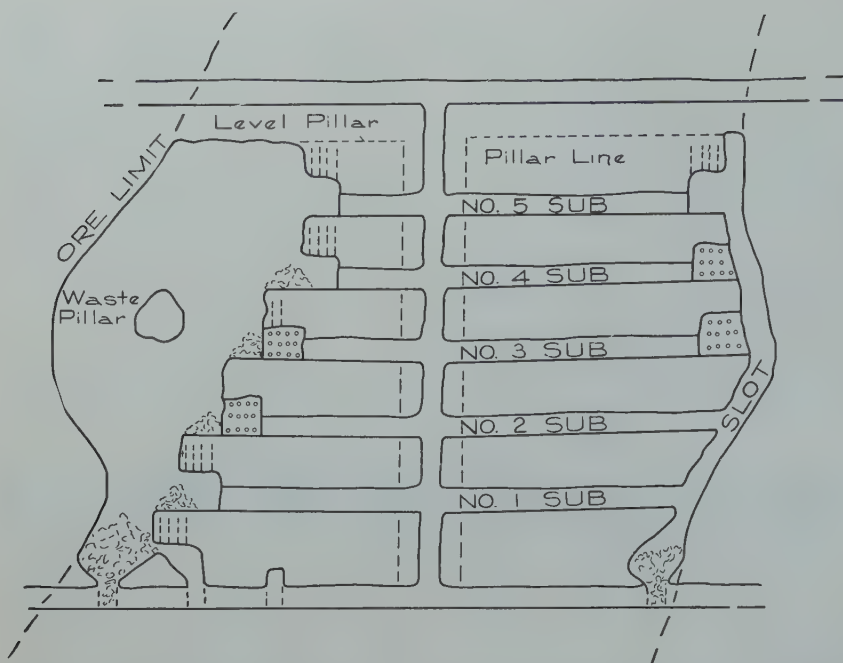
Sublevel stopes: longitudinal section showing general layout and stoping sequence.
